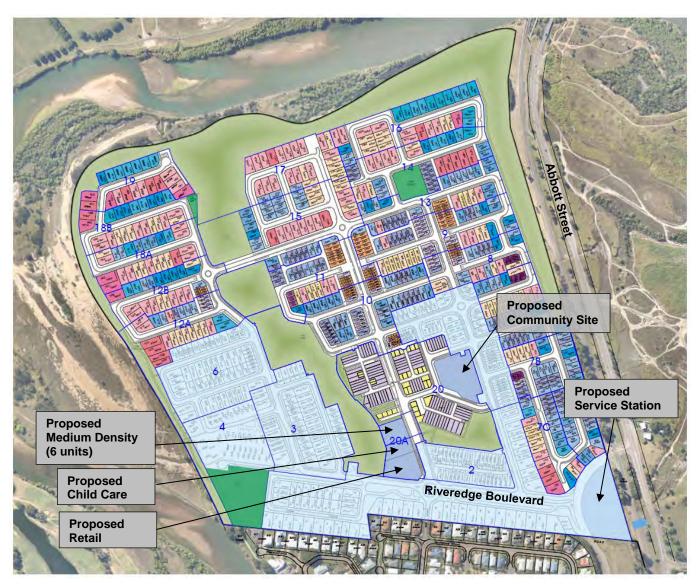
Site Master Plan (Source: Brazier Motti Plan No. 29060/3663F)
